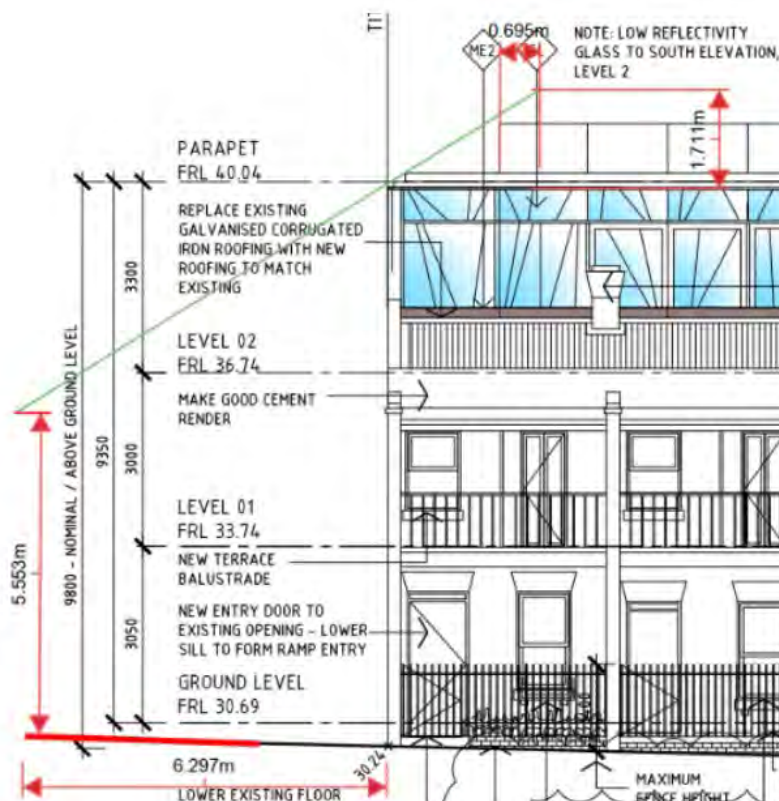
Overlooking diagram provided by the permit application from the proposed roof terrace
